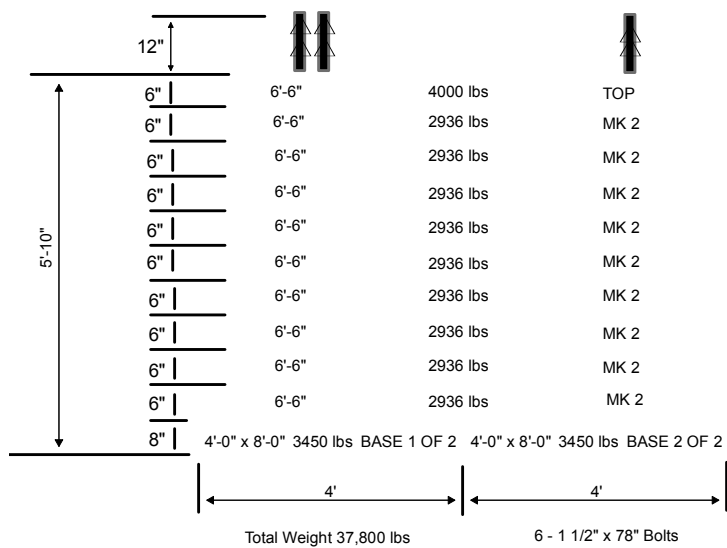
RDT Stacking Slab Tower Foundation Schematic
